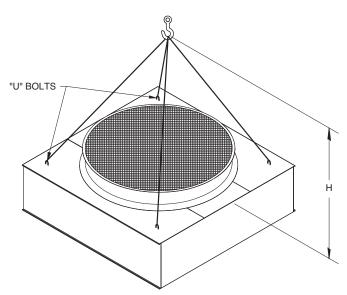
Lifting of fan section, single-fan units— "H" Dimension
